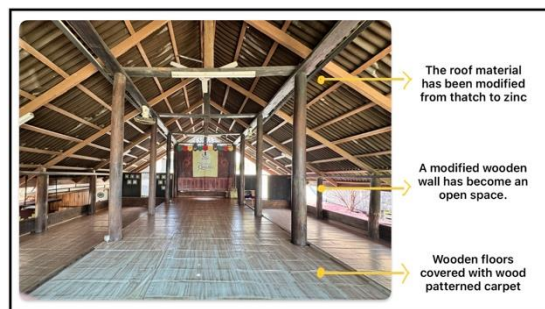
Floor, Wall, and Roof of *Rumoh Aceh
